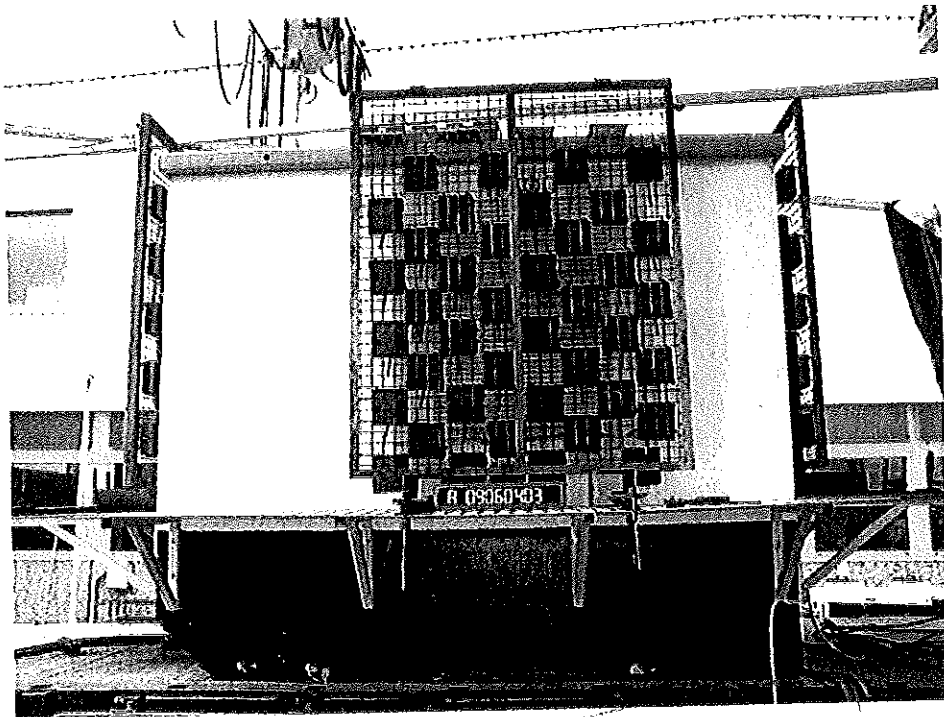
Right side view of the test object with indicators before test no. 090604-03
